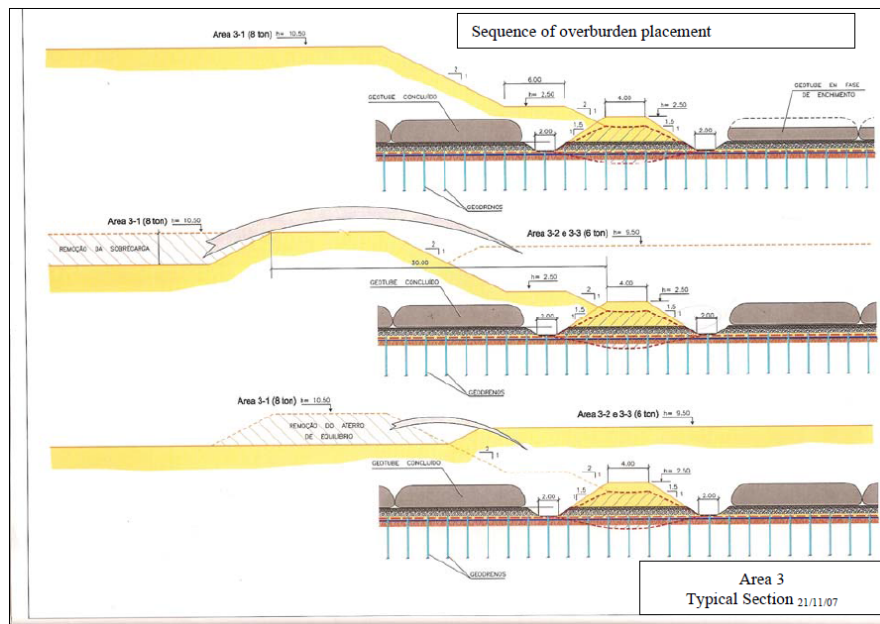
Sketch. Geotextile tube overburden placement sequence (Stephens & Melo, 2013).
